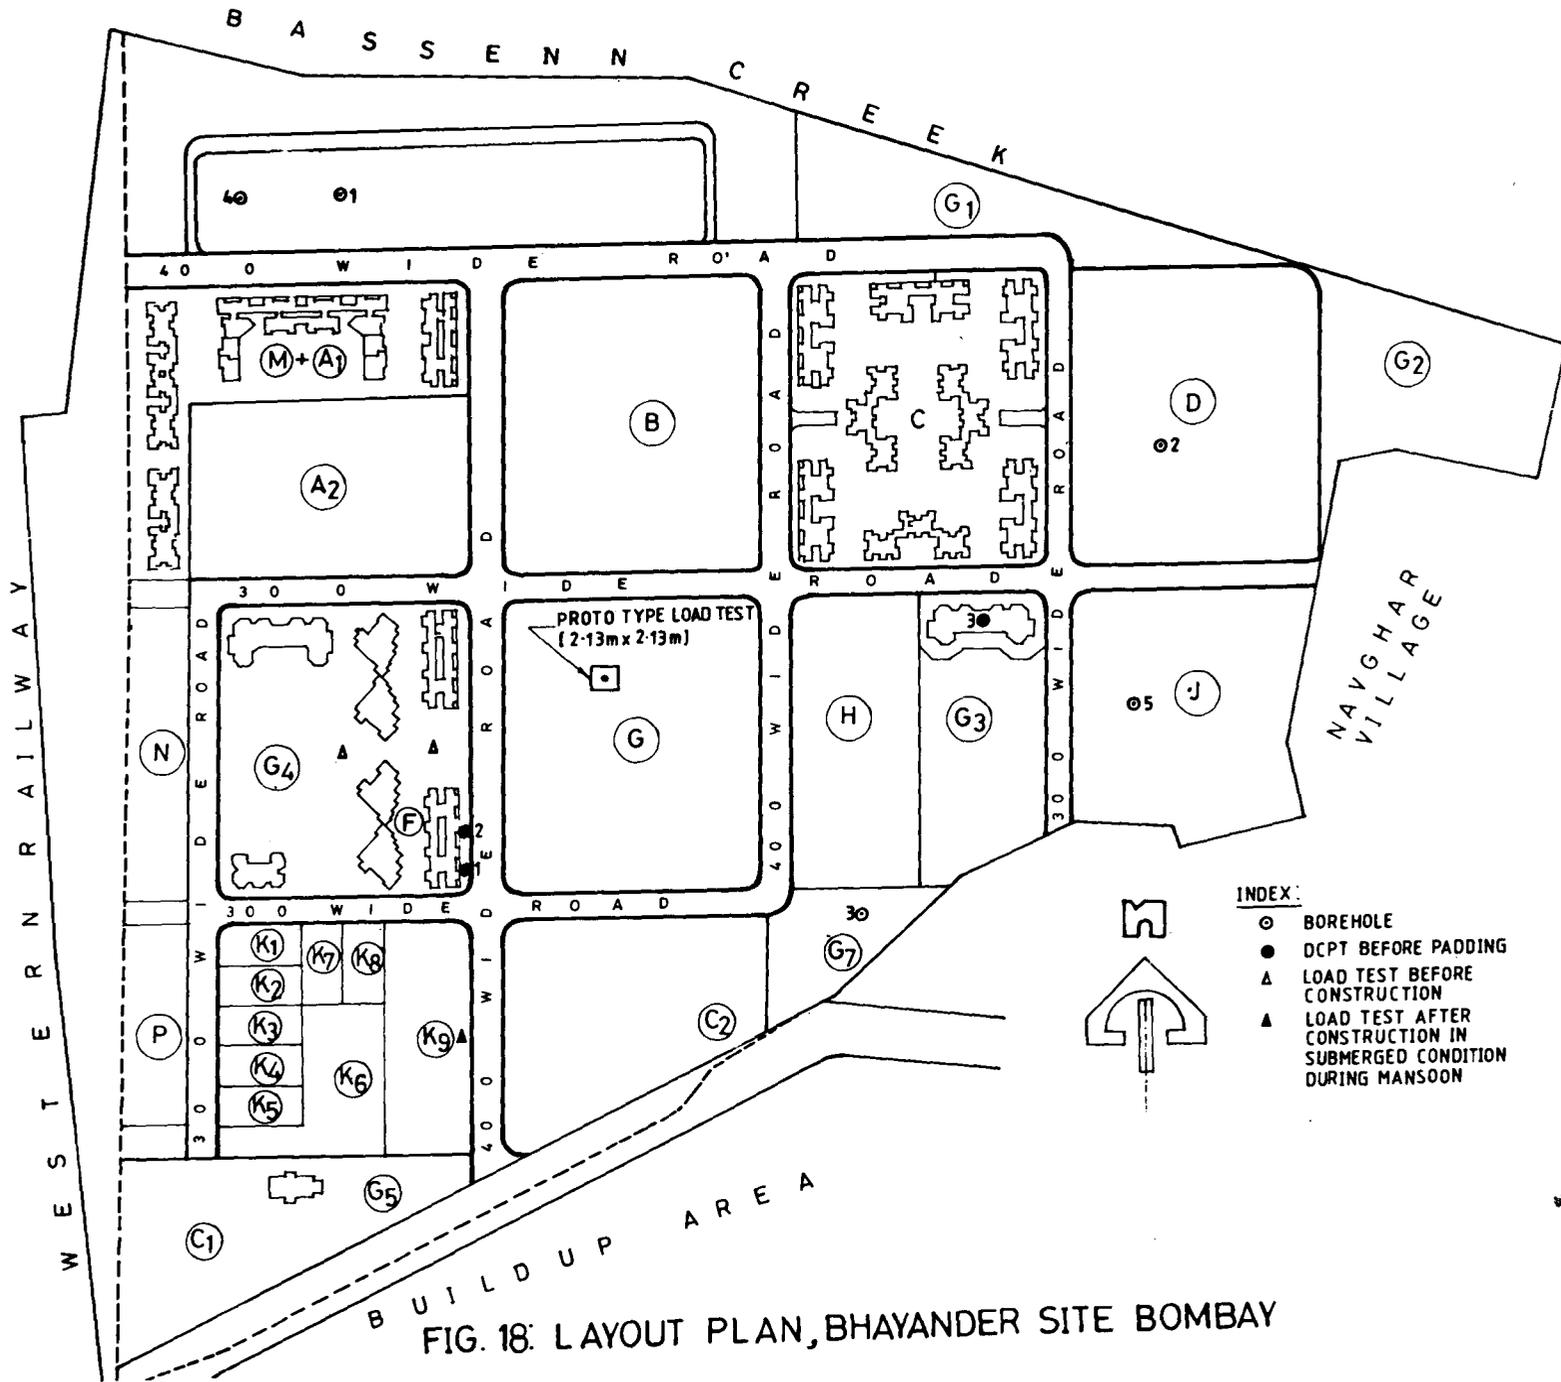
LAYOUT PLAN, BHAYANDER SITE BOMBAY
